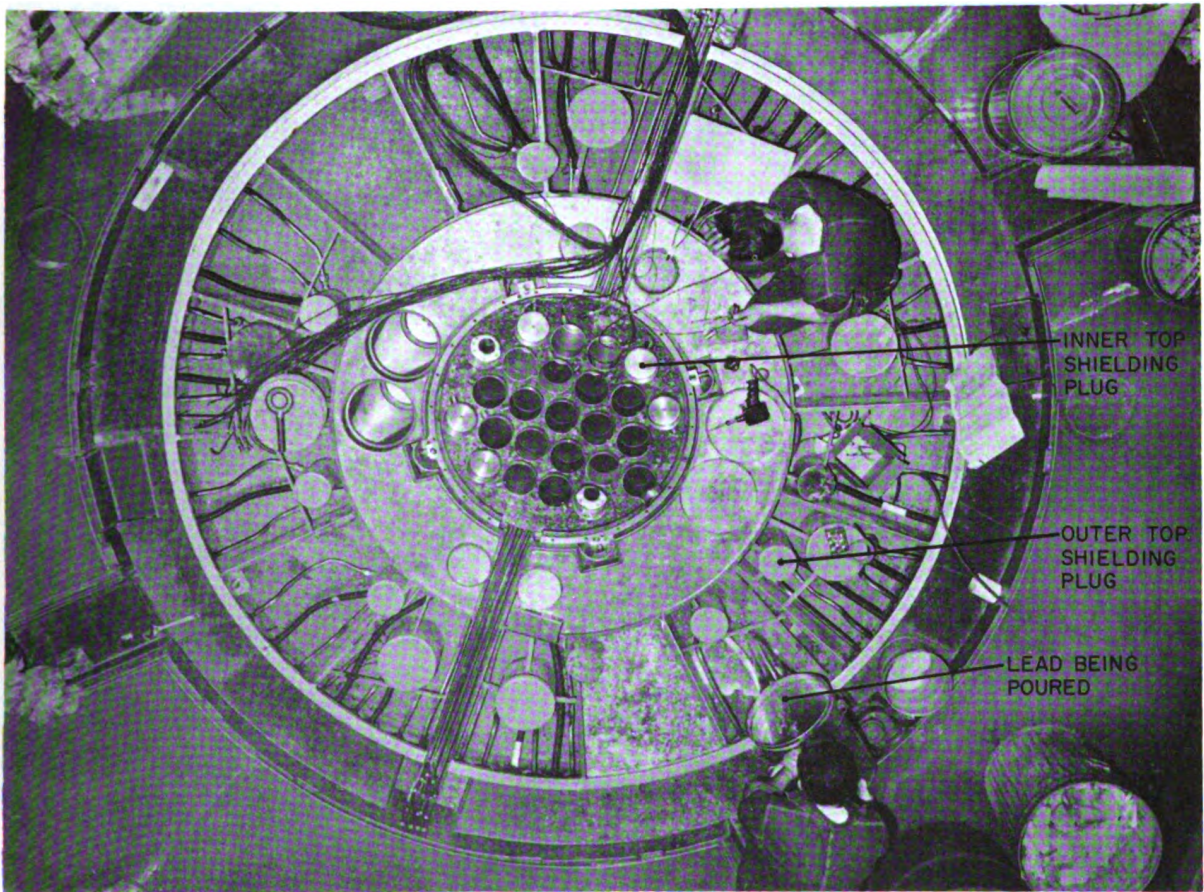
Reactor, before addition of cover plate and lead shielding.
